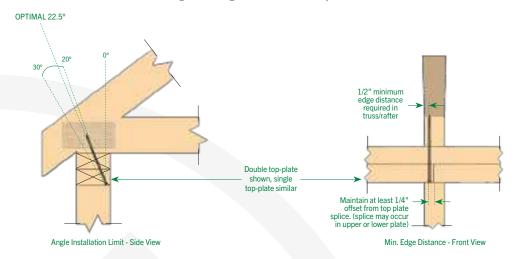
Installation of Fasteners Perpendicular in Single and Double Top Plate to Truss/Rafter When Stud is Offset
